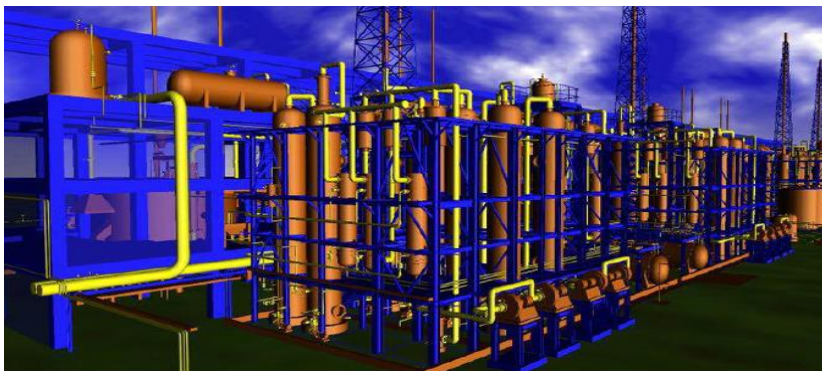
Typical SOP plant. Rendered view. (Kindly Tech Trading Co.)
